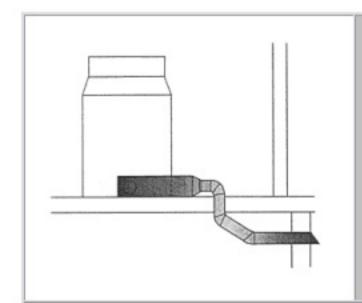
Figure B: This installation provides venting through a round floor hole that leads to an exterior vent through a basement or crawl space wall. Note that two elbows are used beneath the floor instead of one to provide better air flow. 90 degree turns are often unavoidable, but wherever possible, two 45 degree turns are preferable.
